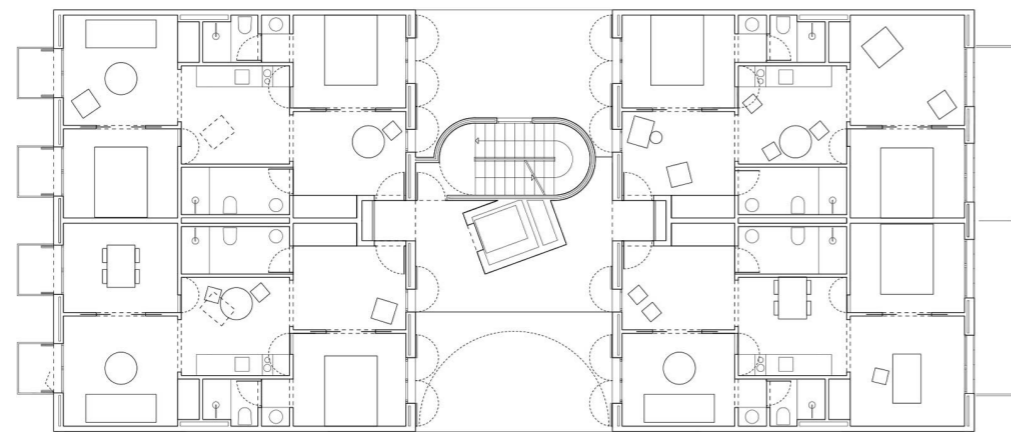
110 rooms typical floor plan (MAIO Architects, 2016)
